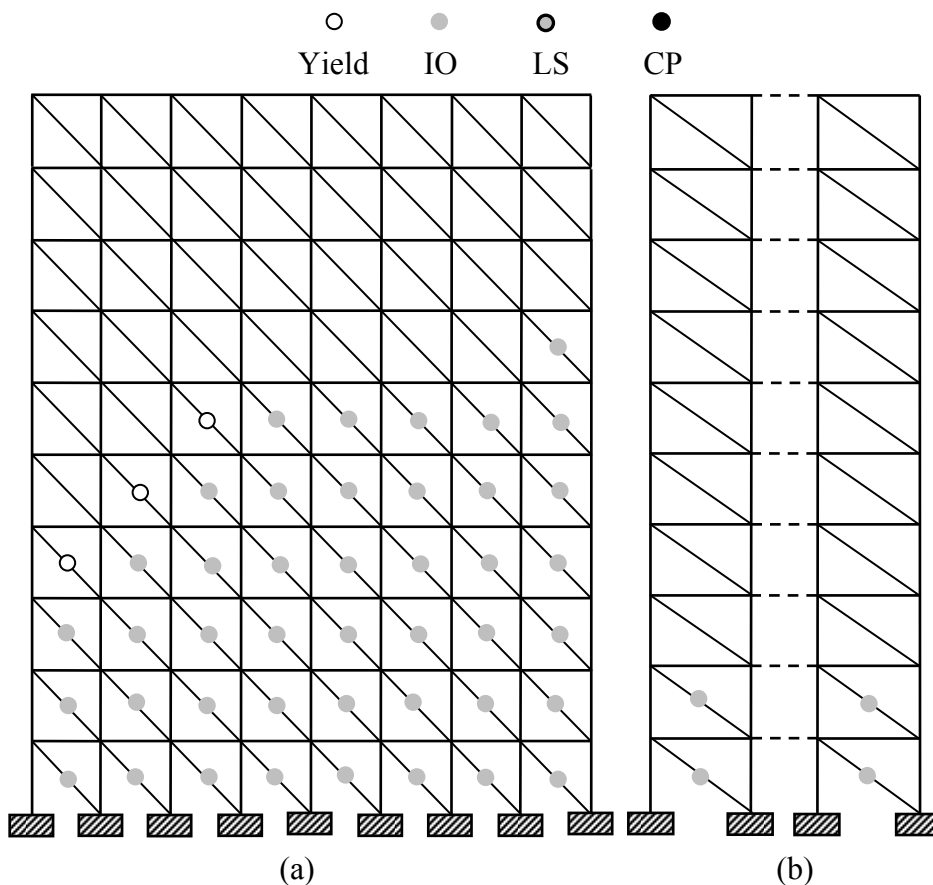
Hinge pattern under gravity load, for the ten storey uniformly infilled frame building, designed for gravity loads only, when construction sequence is not considered in analysis: (a) typical longitudinal frame; (b) typical transverse frame.
